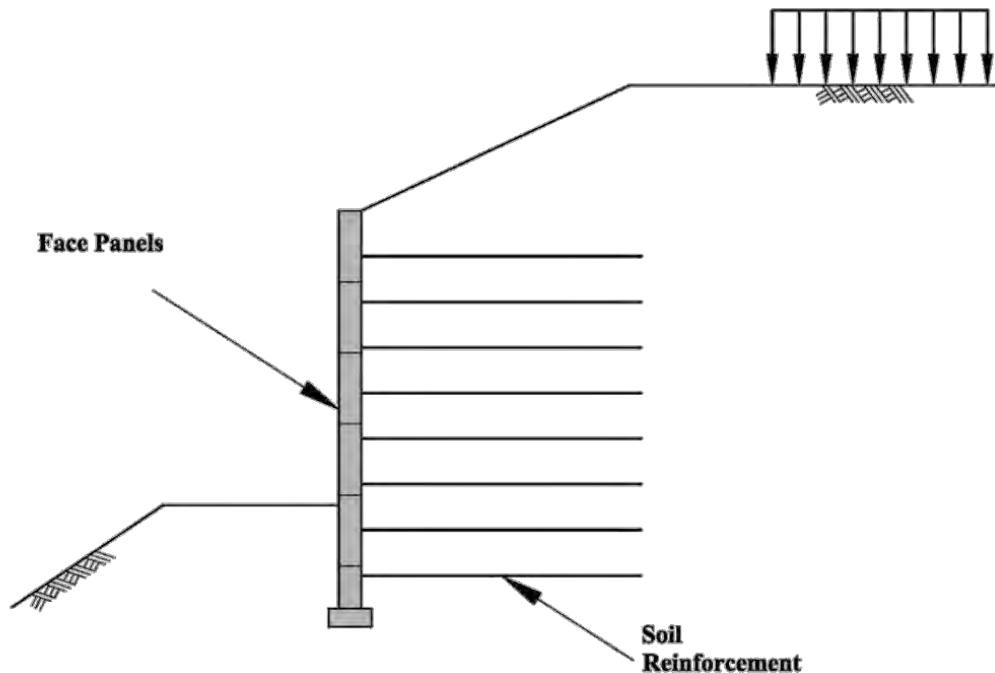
MSE Wall with Precast Concrete Face Panels
